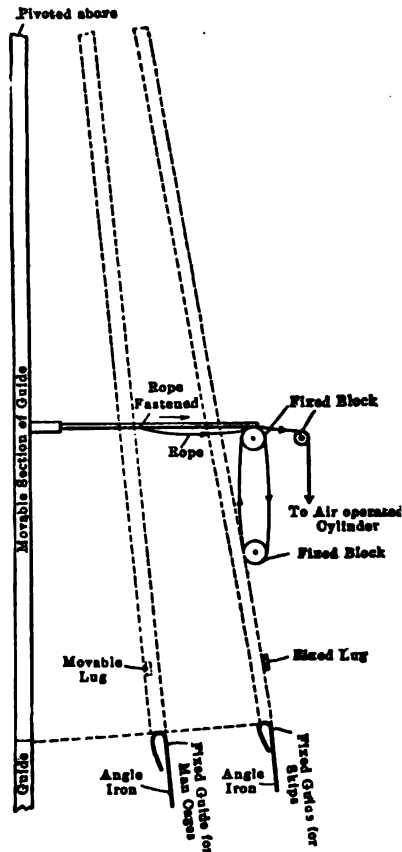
ARRANGEMENT FOR INTERCHANGING SKIPS AND CAGES ON LEONARD NO. 2 HEADFRAME, BUTTE.
